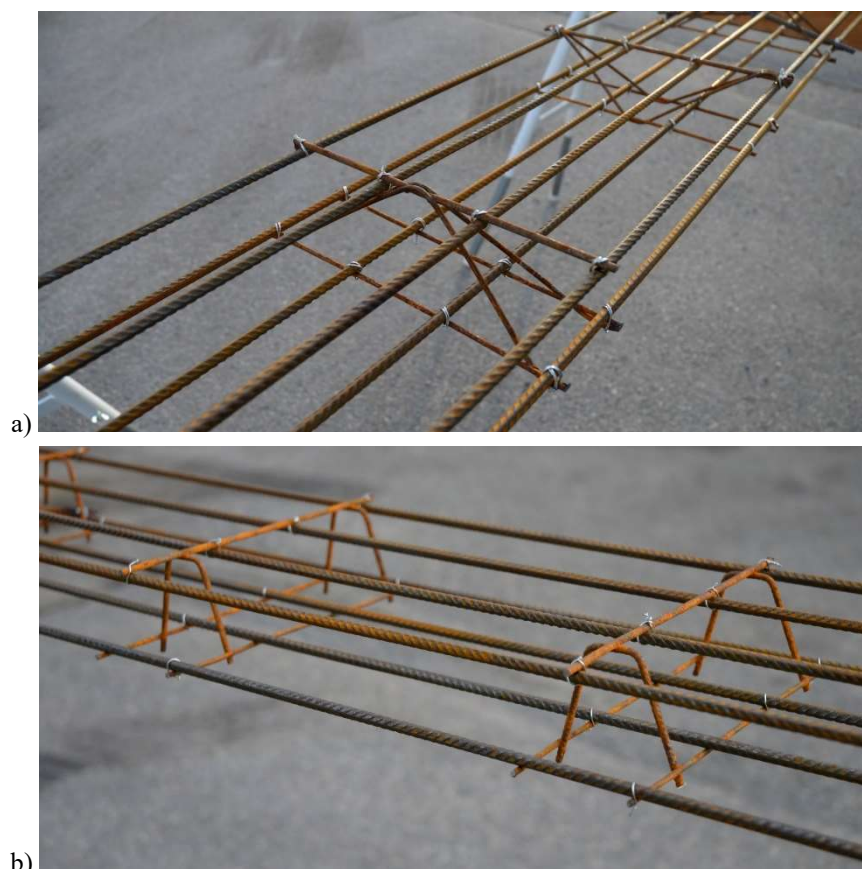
Example of the two different reinforcement layouts of the wall elements, with figure a) referring to wall elements B1-B11 and figure b) referring to wall elements S1-S5.
